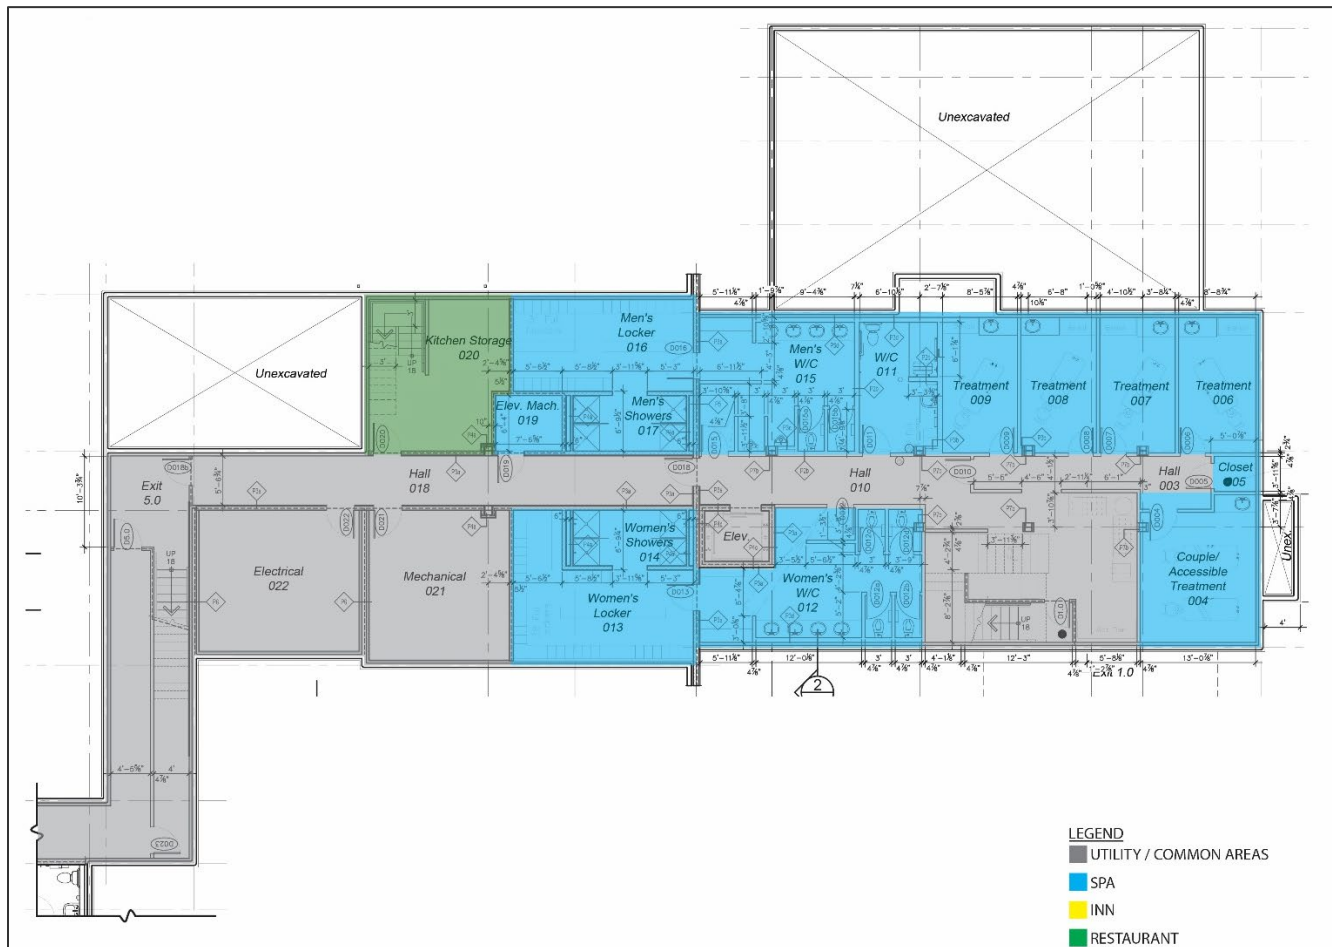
Floor Plans (source: Shoalts and Zaback Architects)
